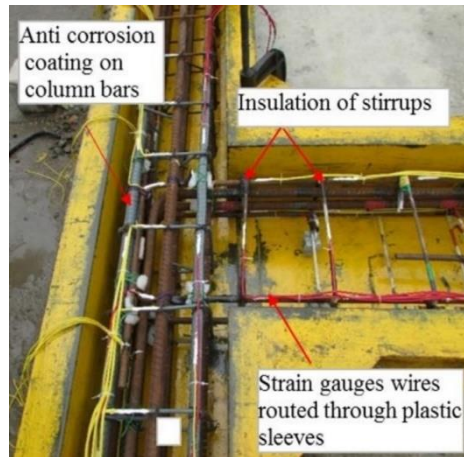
4 PVC insulation on stirrups of beam and column and at longitudinal rebars of column (Kanchanadevi and Ramanjaneyulu 2018)
